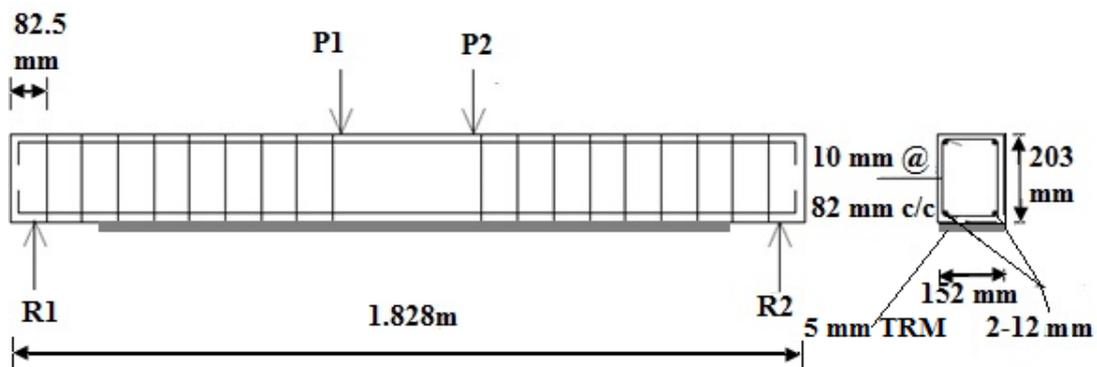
R/F details for TRM-A beams without anchorage a/d 4.27
